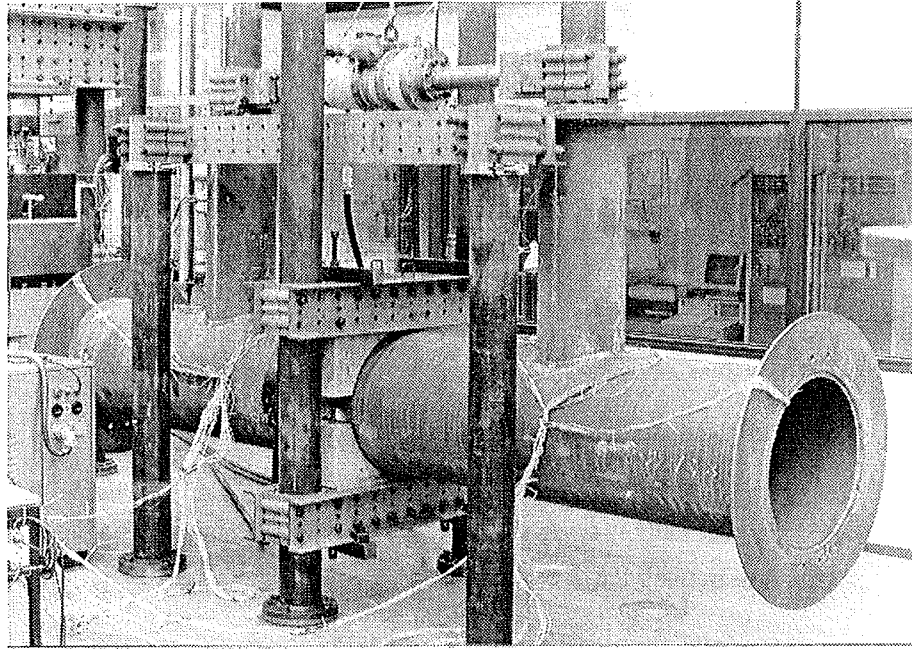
Test arrangement in investigation on full-scale double T-joint.
